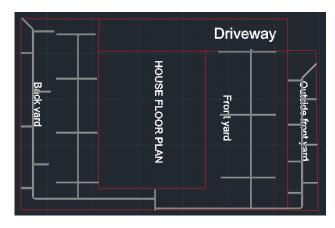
Preliminary Idea 1 for pipe layout for each zone, pipe networks consist of one supply pipe with branches that supply sprinklers.
